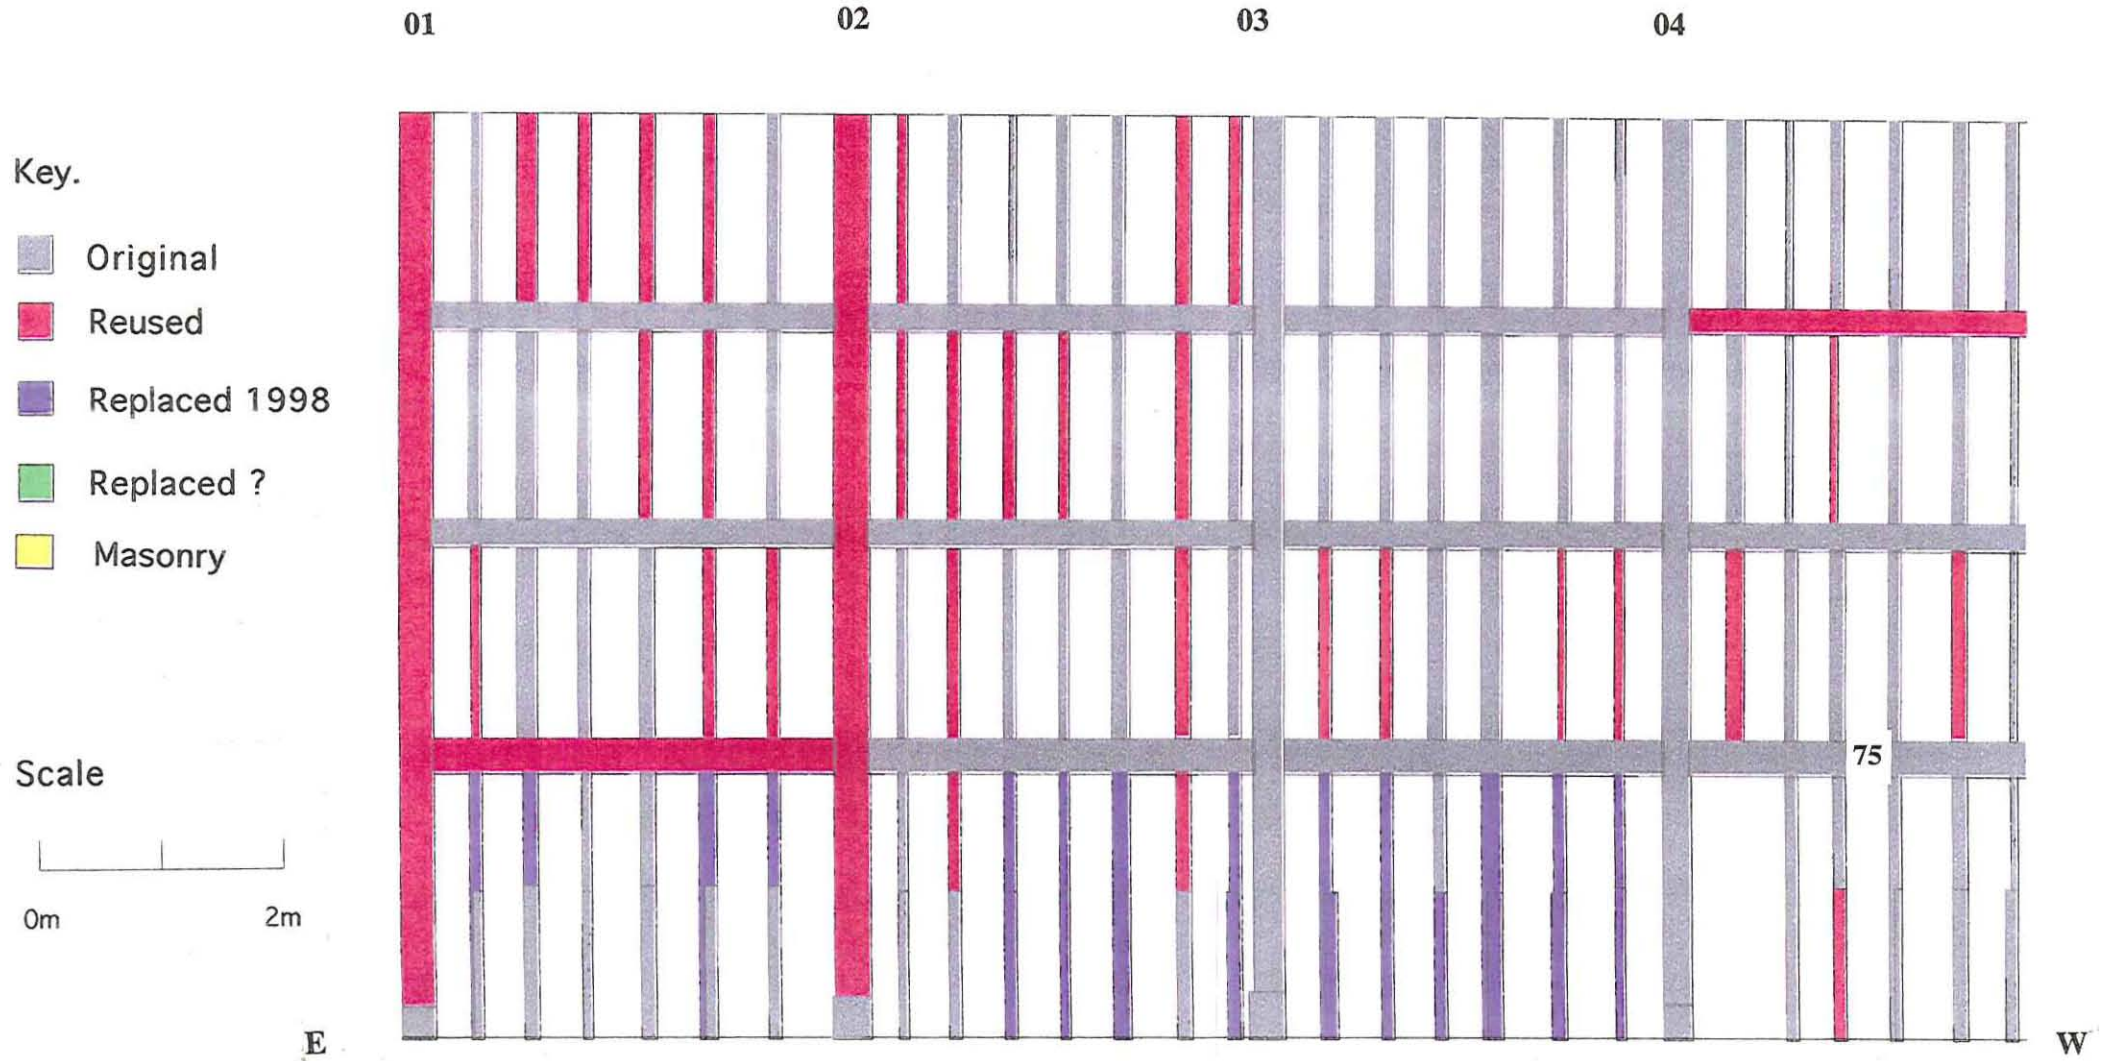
(2): South elevation of choir roof (western half) to show sample locations
